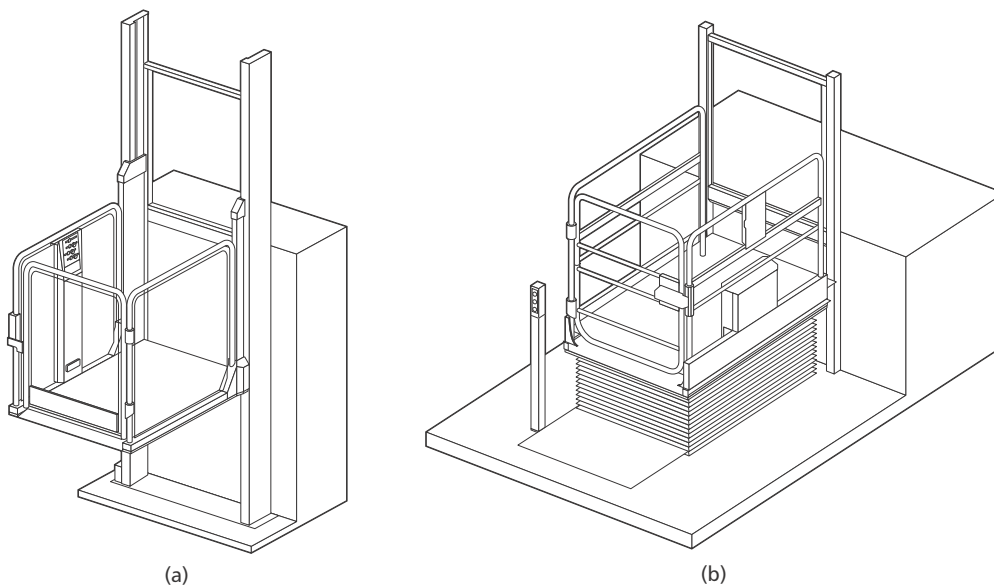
Lifting platforms with non-enclosed liftways; (a) cantilever type with under-surface protection, (b) scissor type with bellows protection
